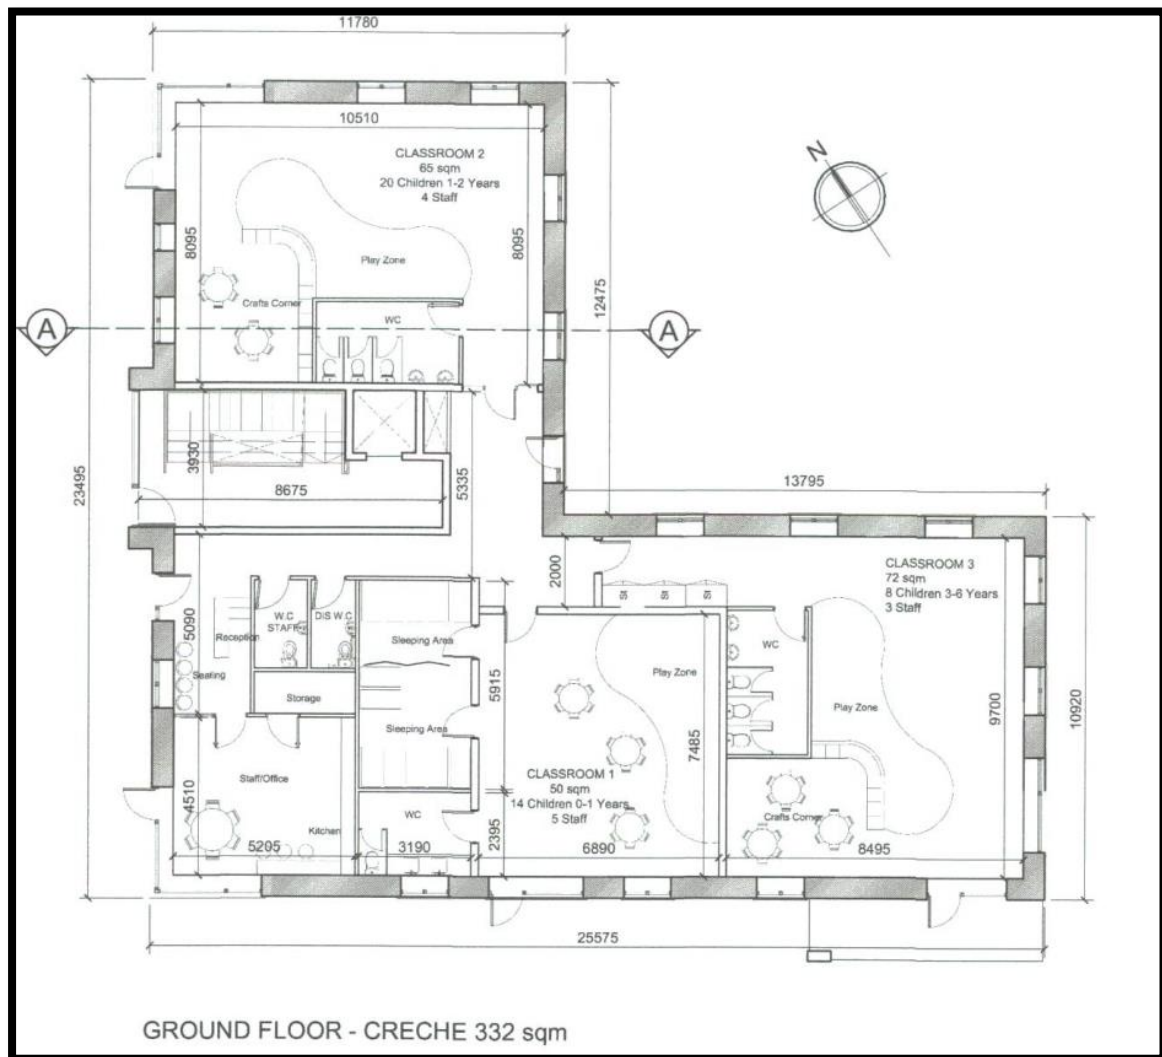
Extract from Floor Plan of Creche permitted under Pl. Ref. No. 19/1978.
